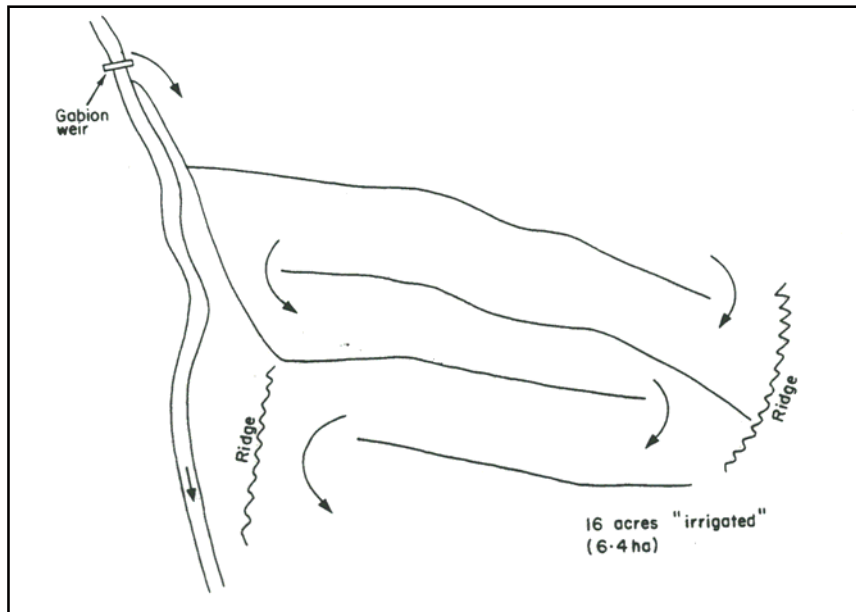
Layout of a typical flood water diversion system (Fallon 1963)
